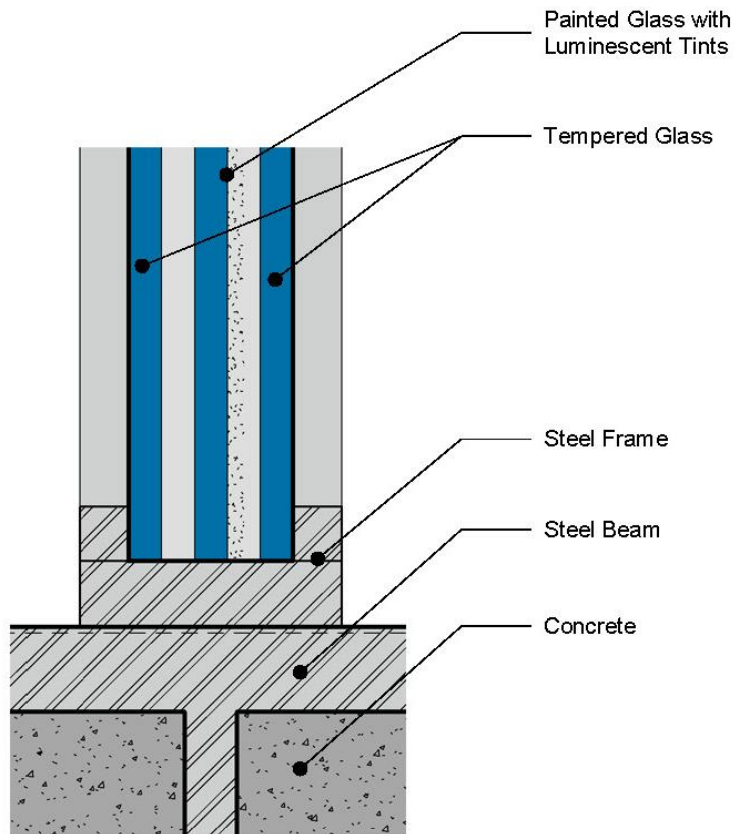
Detail of the tempered glass, painted glass, steel frame and beam, concrete
